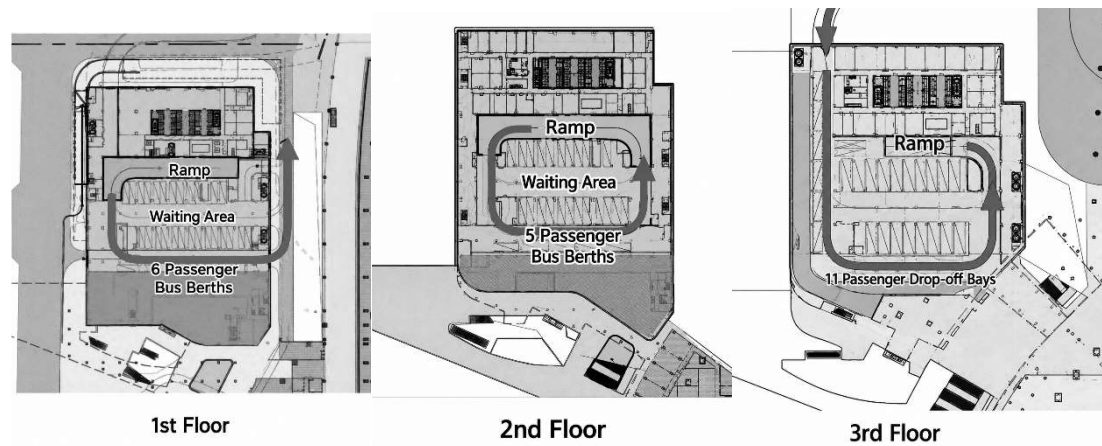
Schematic Layout of the Bus Terminal at Guangzhou Baiyun Station
